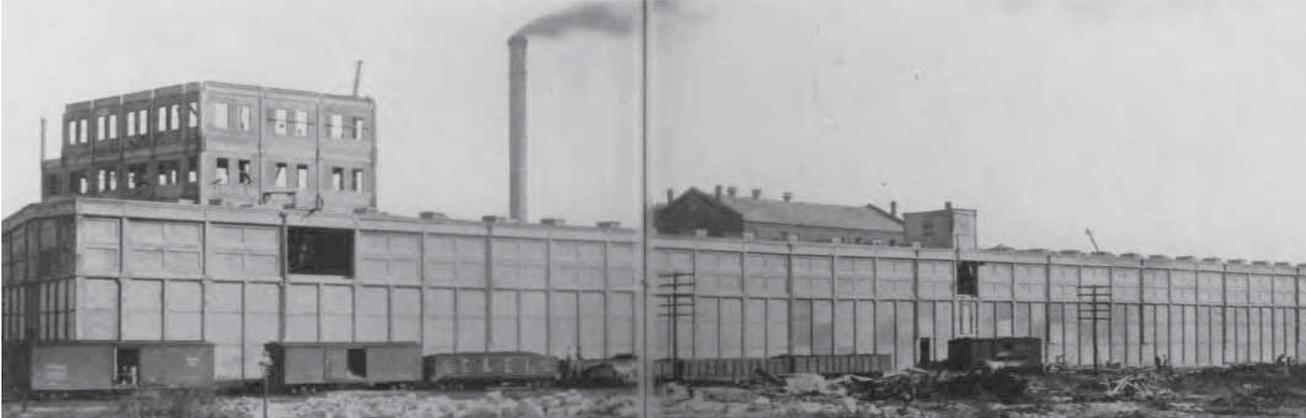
The exterior of a building within the National Lead Company complex in St. Louis, which was constructed with reinforced precast concrete panels (Unit Construction Co. 1913:16).
